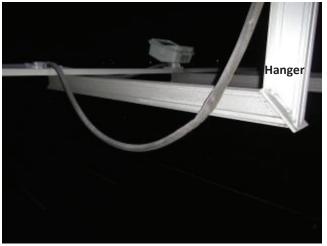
Loose conduit hanging below hangers and reducing vertical clearance
